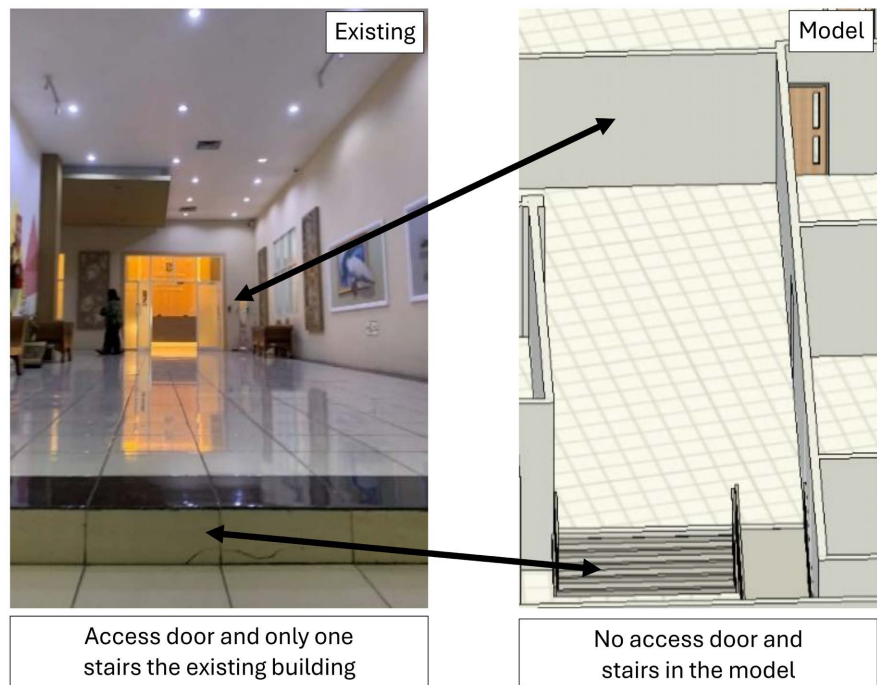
Example of a drawing plan that does not represent the existing building elements.
